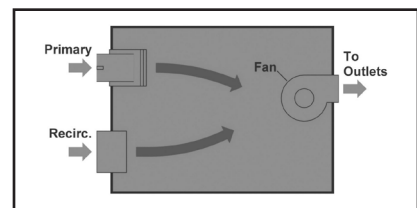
Plan View - Fan Powered, Access Floor Profile (Constant Volume)
